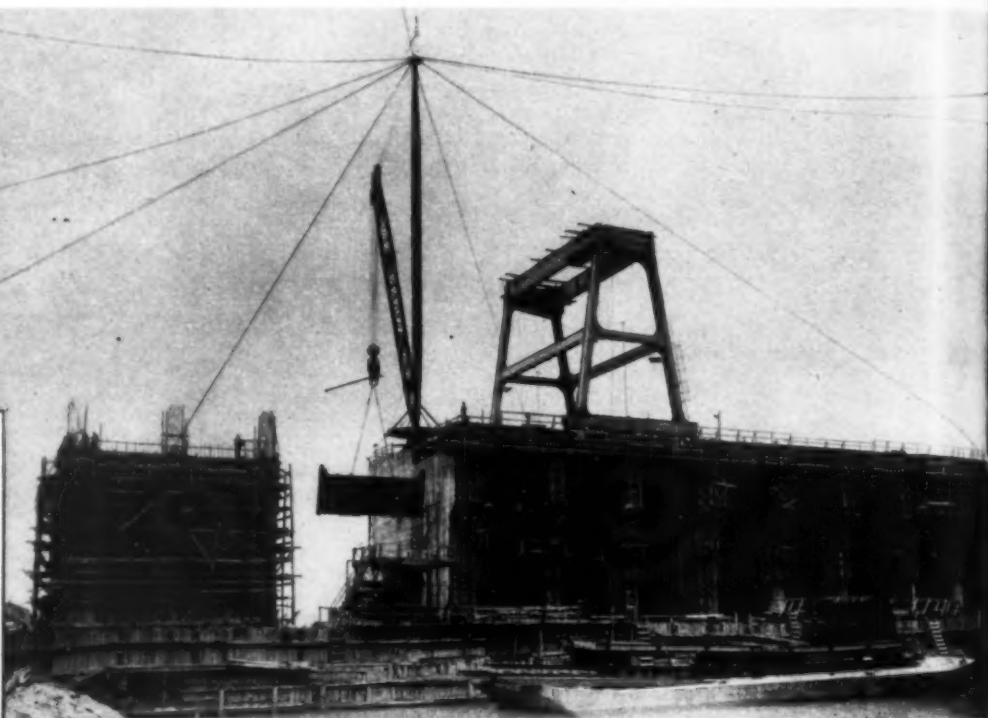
SPECIAL DERRICK set-up for erecting gantry crane and handling heavy castings at Wheeler dam.
